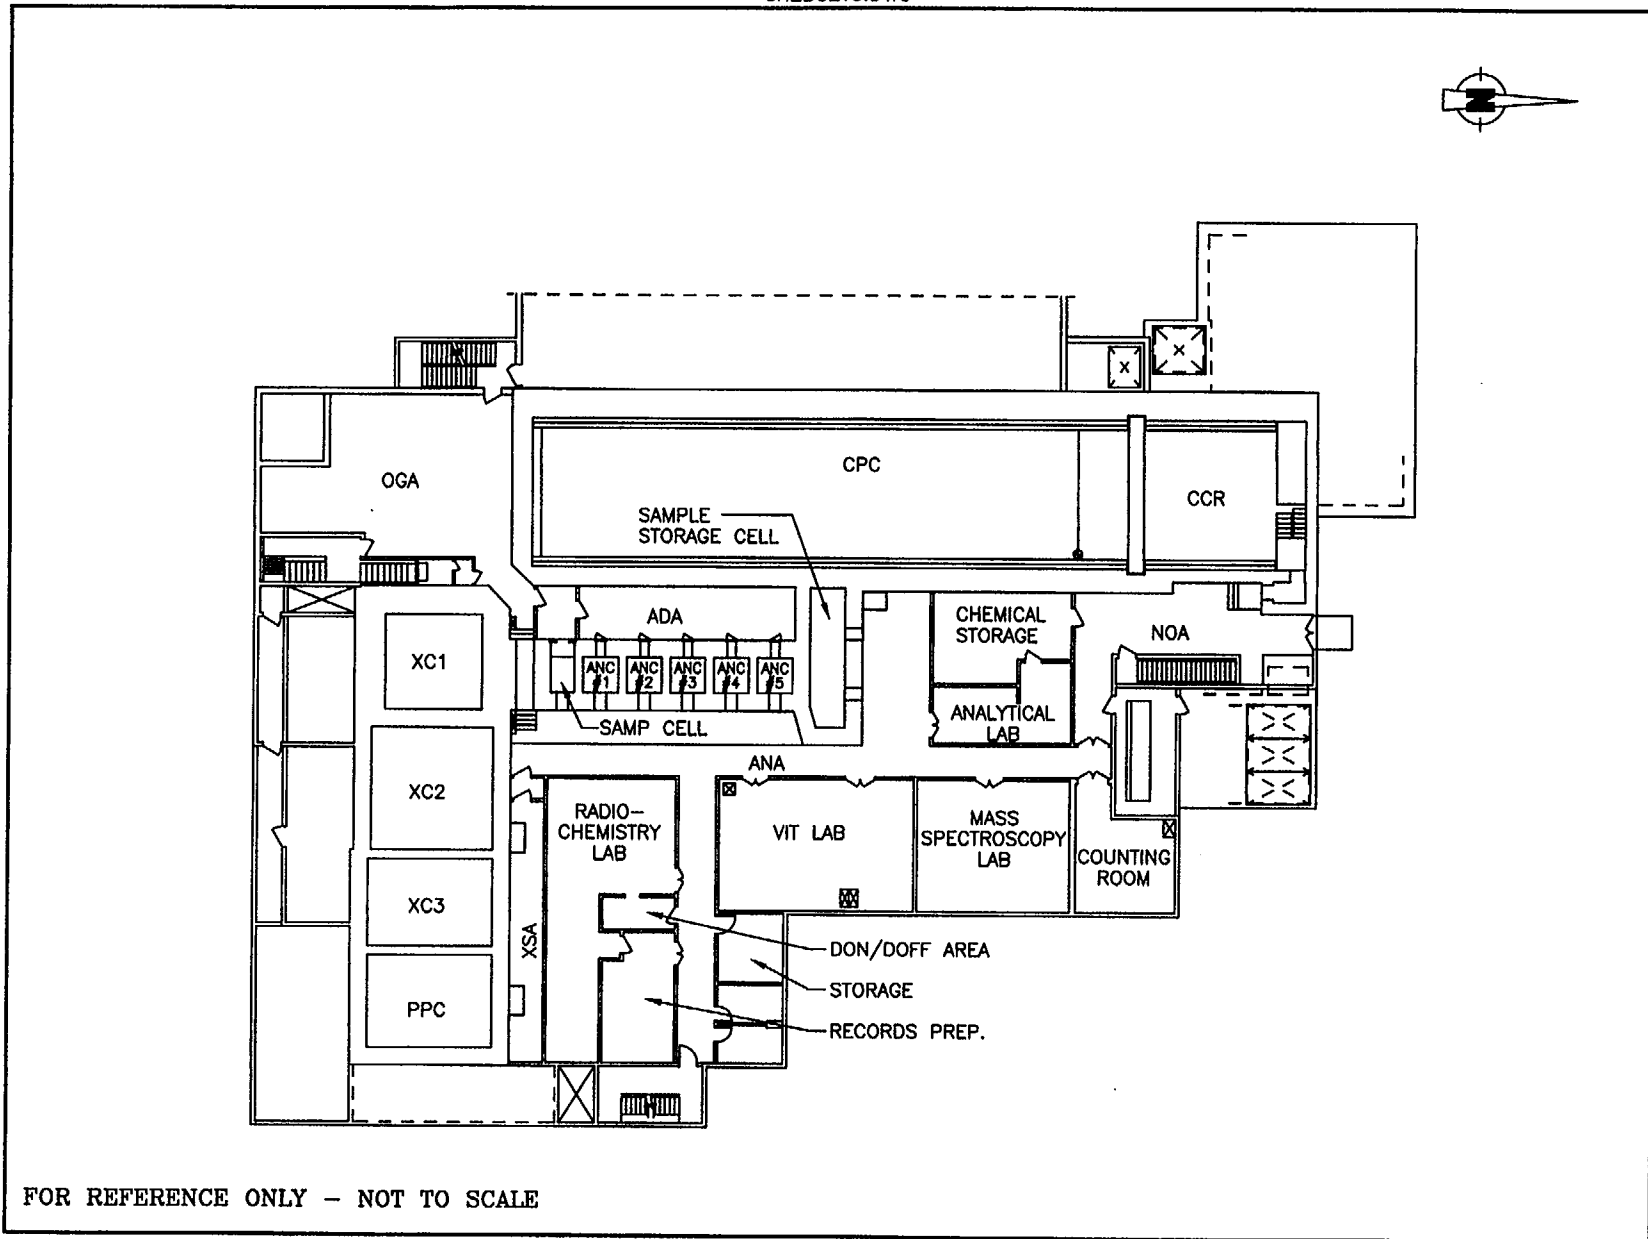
Main Plant Plan at Elevation 100.0'
